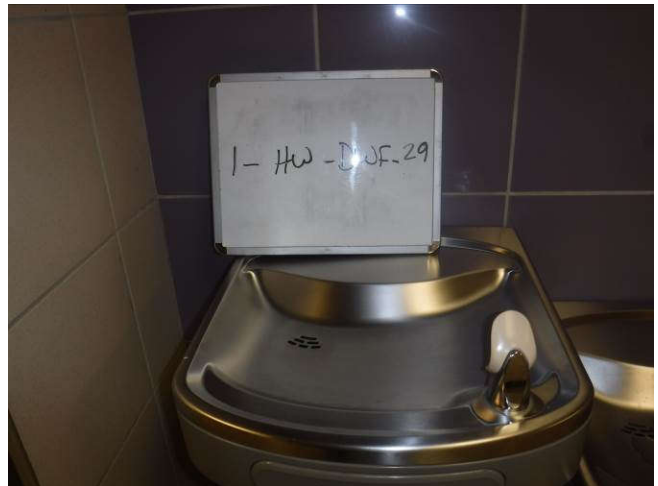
Drinking water fountain, located in a 1st floor hallway across from room 122 next to 123 (left fixture) not working
